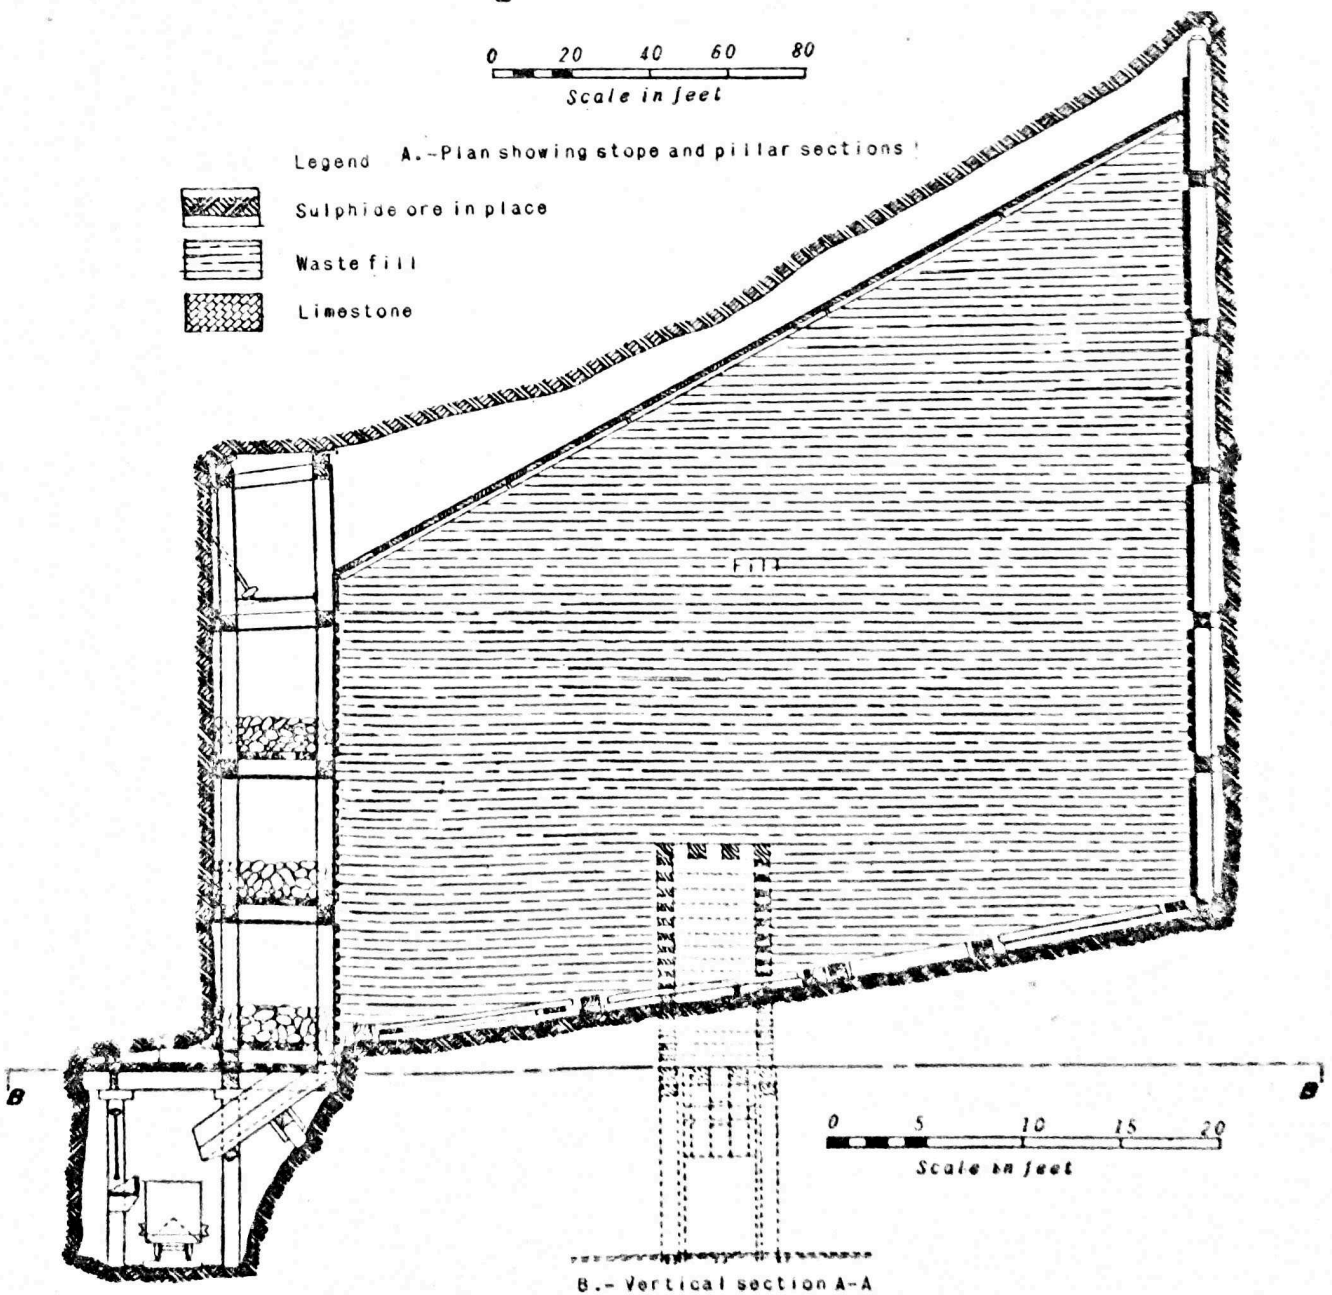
Inclined, single-lead, single cap, cut-and-fill stope with fill raise in footwall
